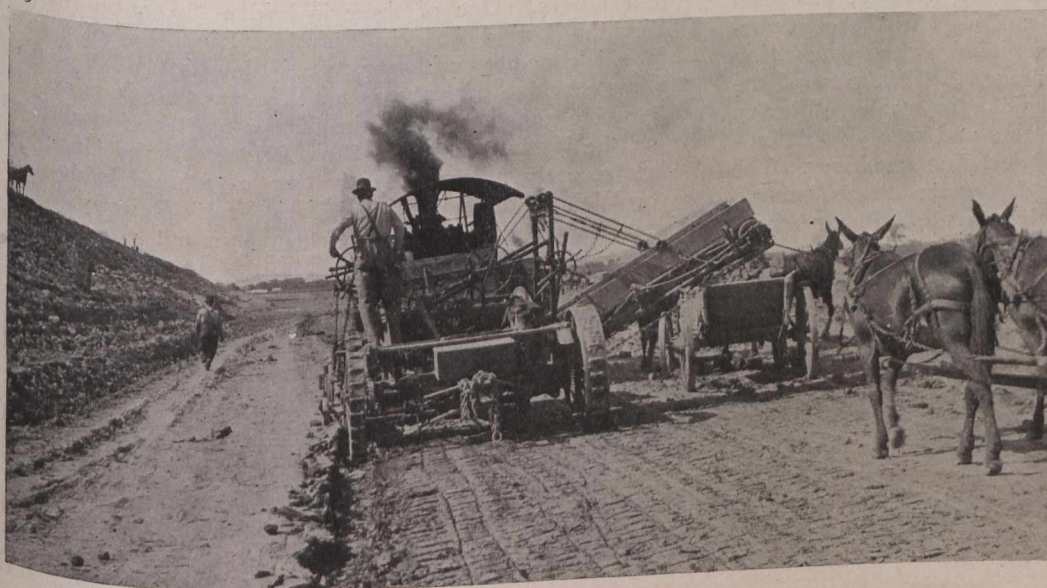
Grader and Mule Outfit Working on a Watertight Embankment, Section 2.
